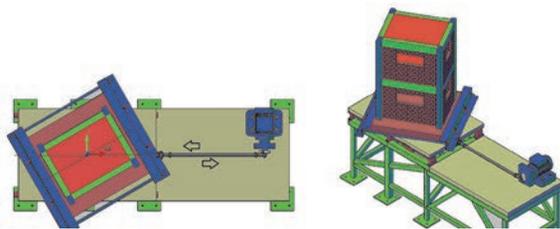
3D and plan view of Specimen 4 (angle: 60°)
